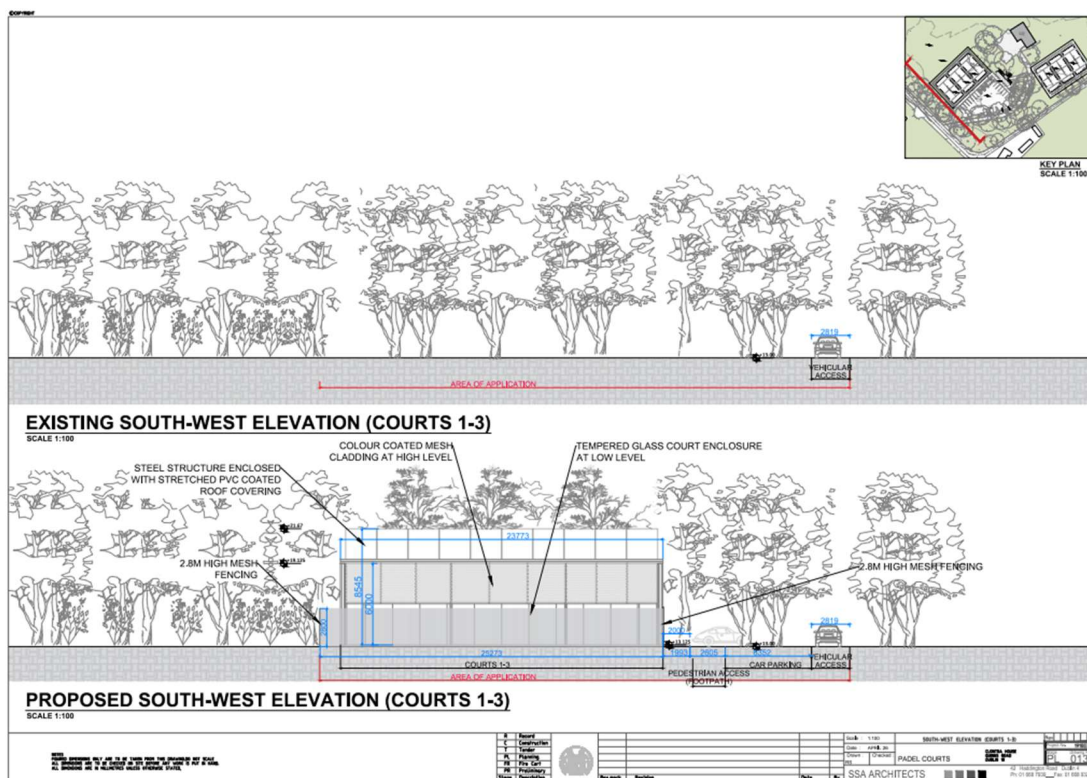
Existing and proposed South-West Elevation for Courts 1-3
